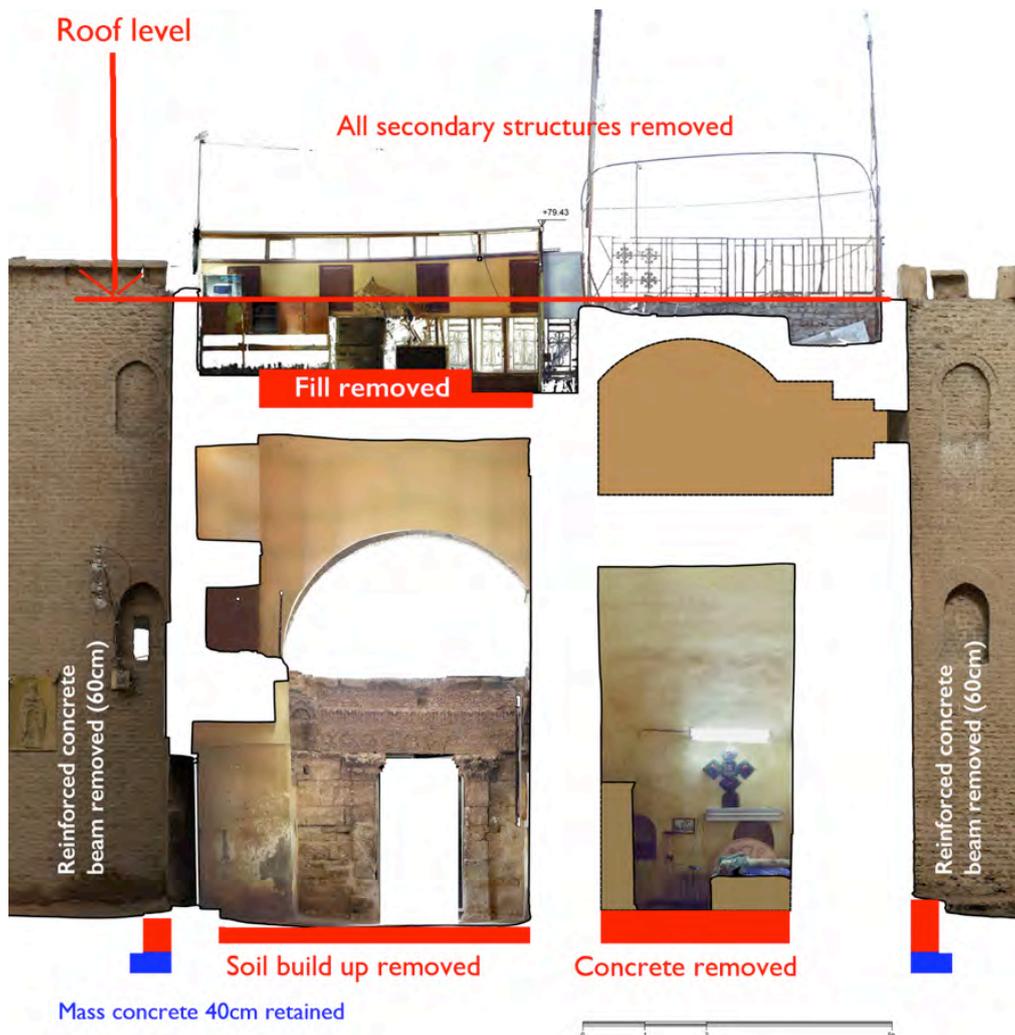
East-west section through tower entrance area looking north showing elements removed
